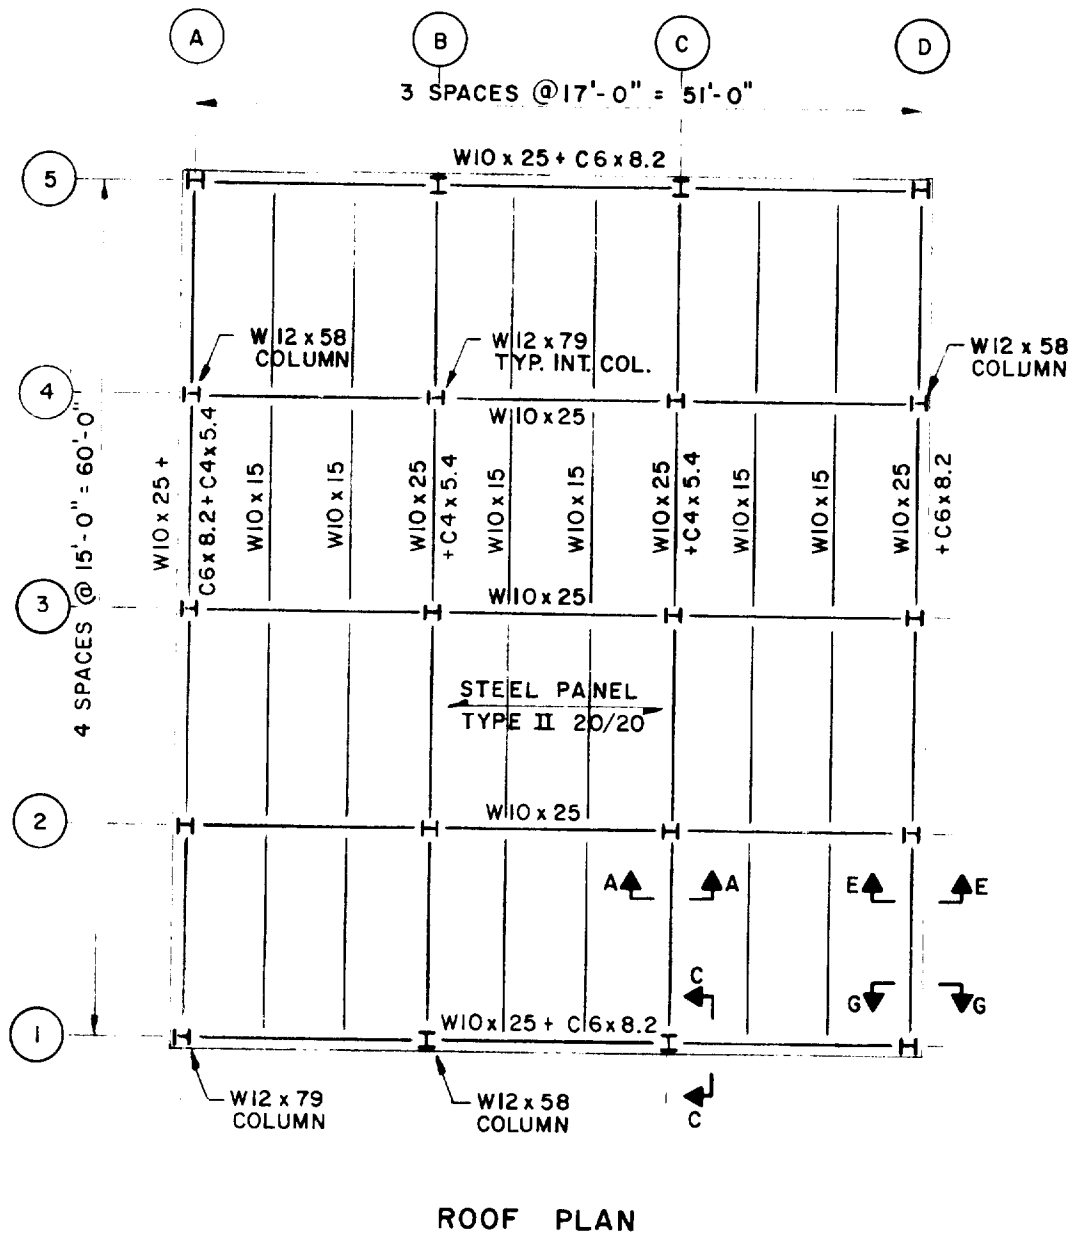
Typical framing plan for a single-story blast-resistant steel structure
